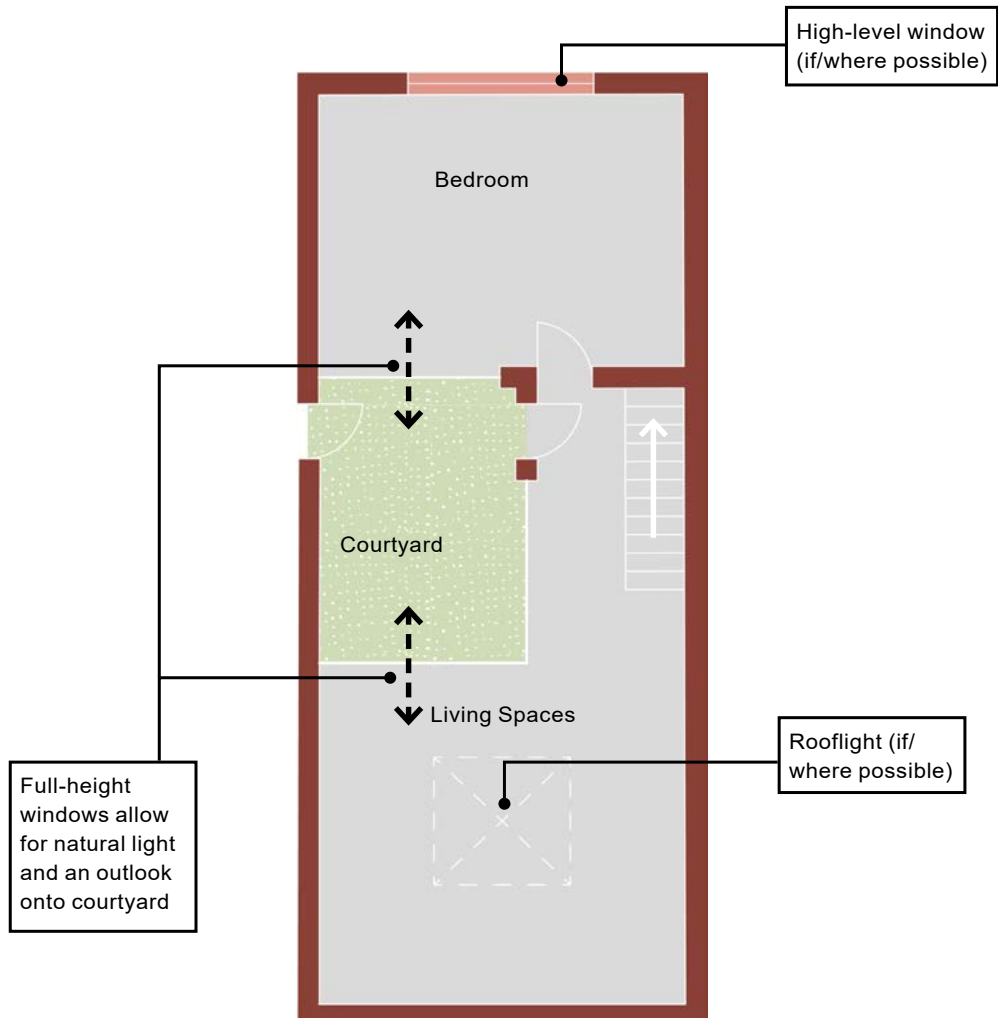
Diagram illustrating solutions to access natural light on a constrained site that limits externally facing windows.
